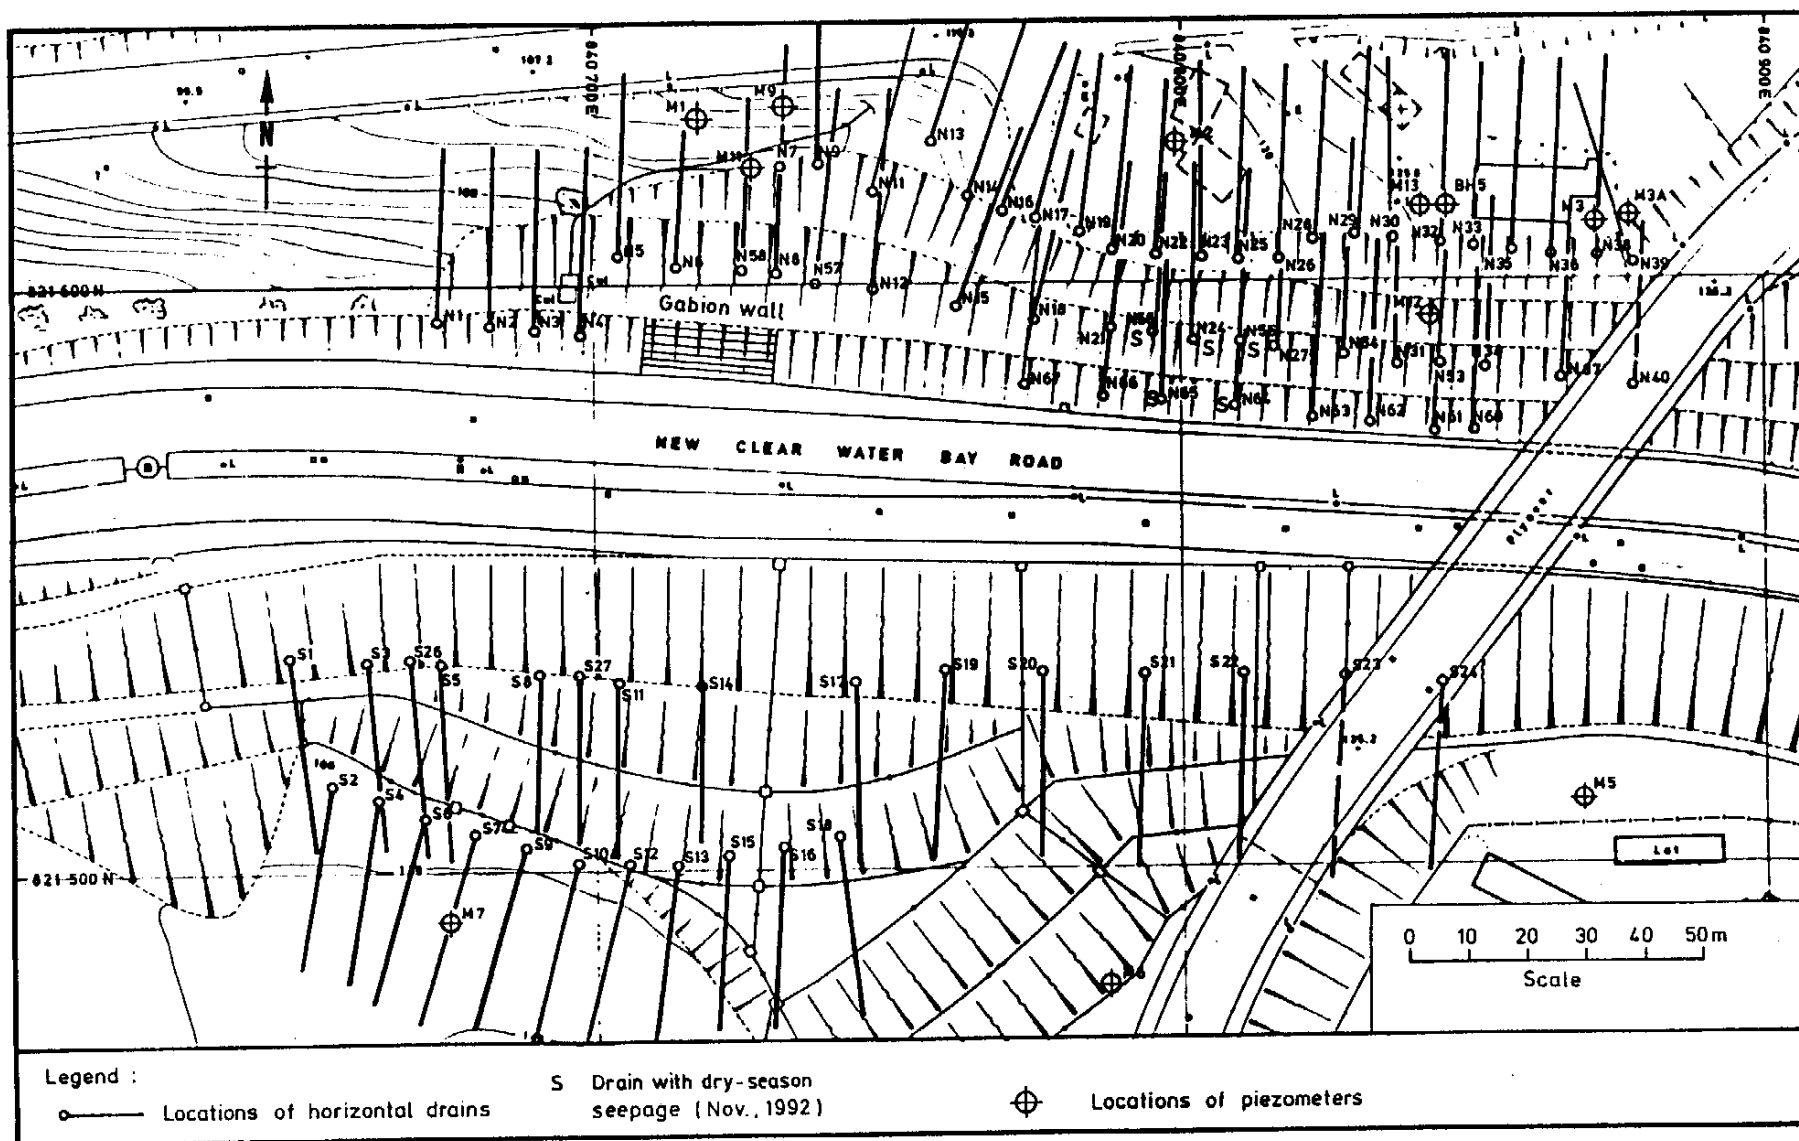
Layout of Horizontal Drains at New Clear Water Bay Road (after MAA,1983)
